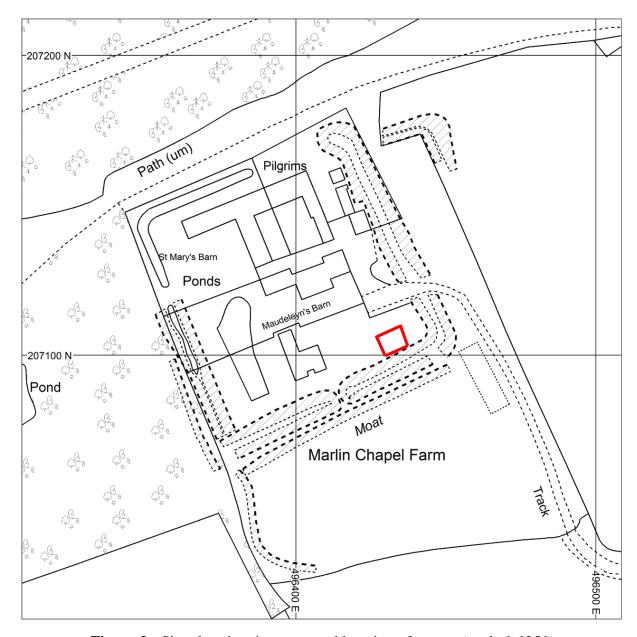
Site plan showing proposed location of garage (scale 1:1250)
